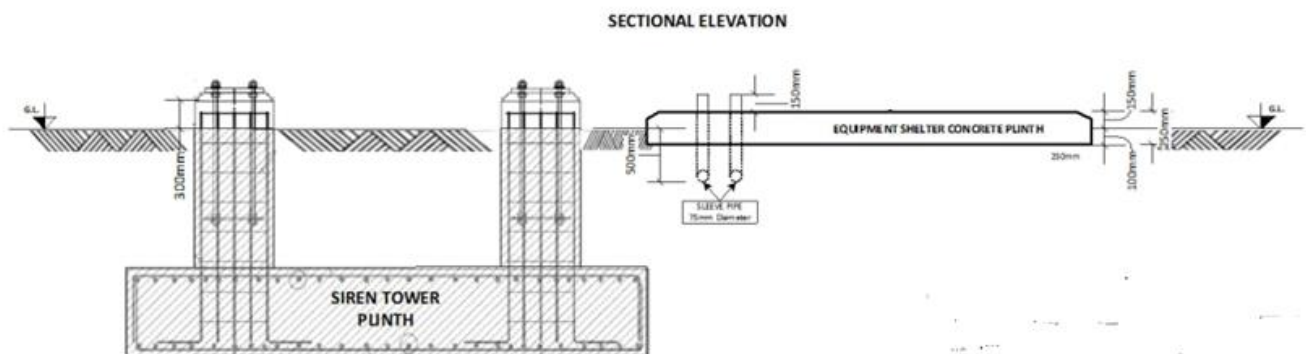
Sectional Elevation View for the Typical Foundation Design for the Siren Tower Structures
